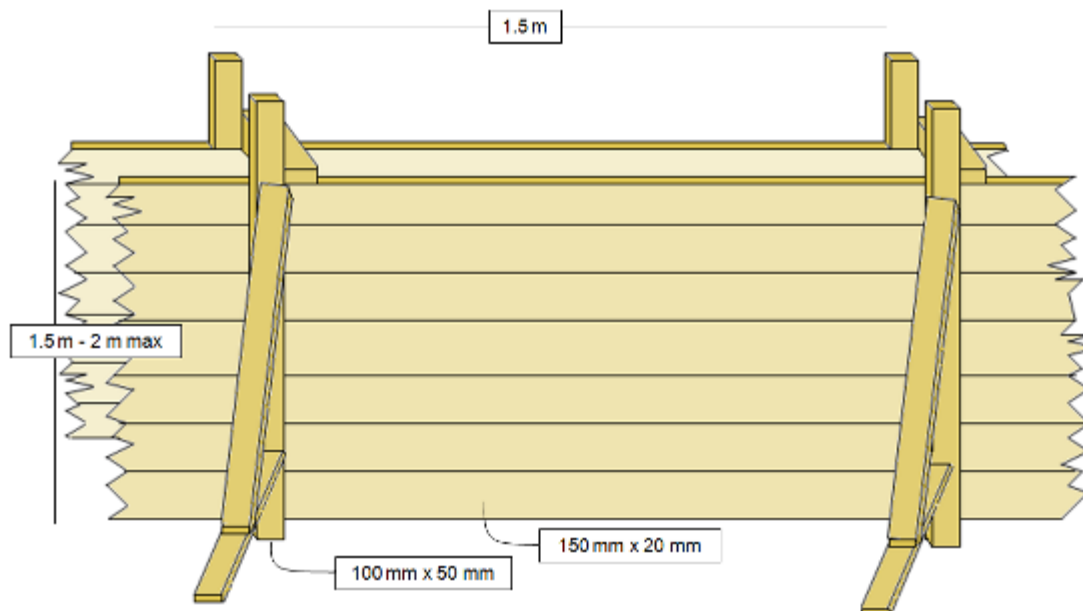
Typical timber sizes and spacing used as formwork in Kenya
